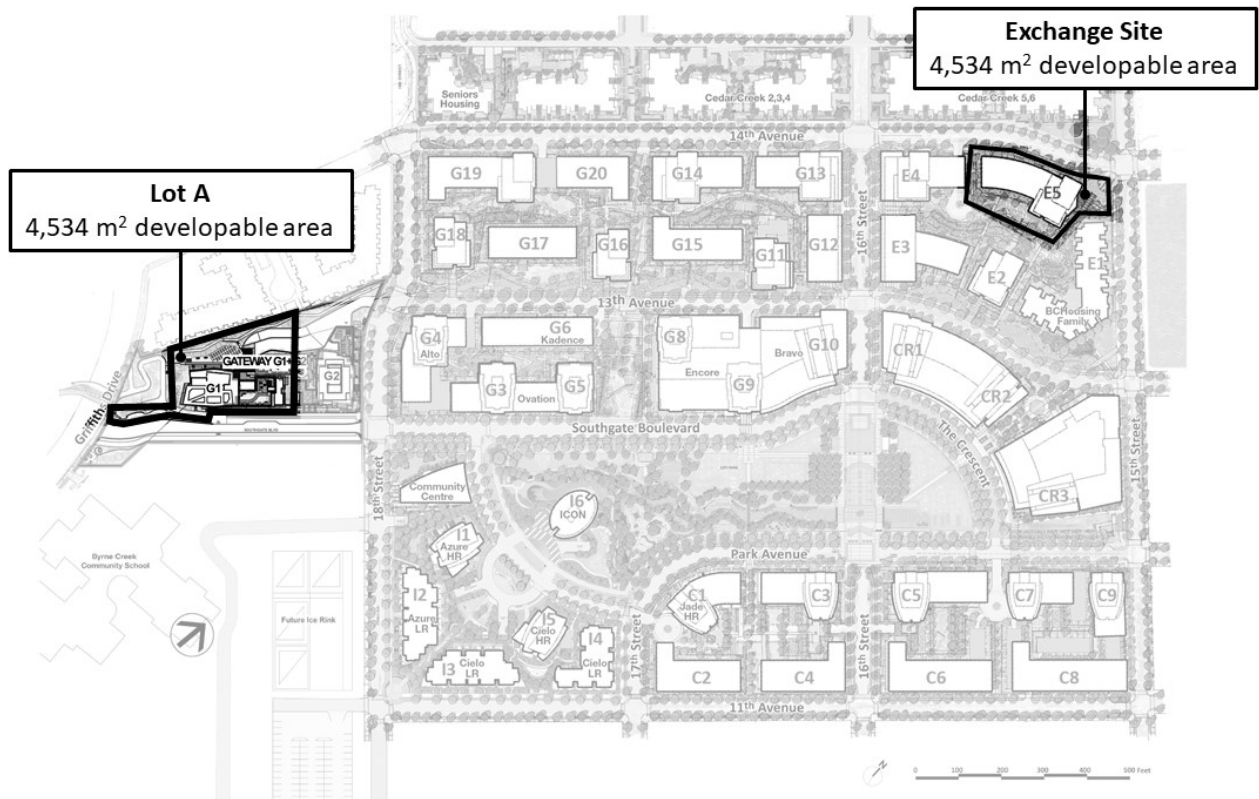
Land Exchange Sites and Development concept for the broader Southgate Master Plan
